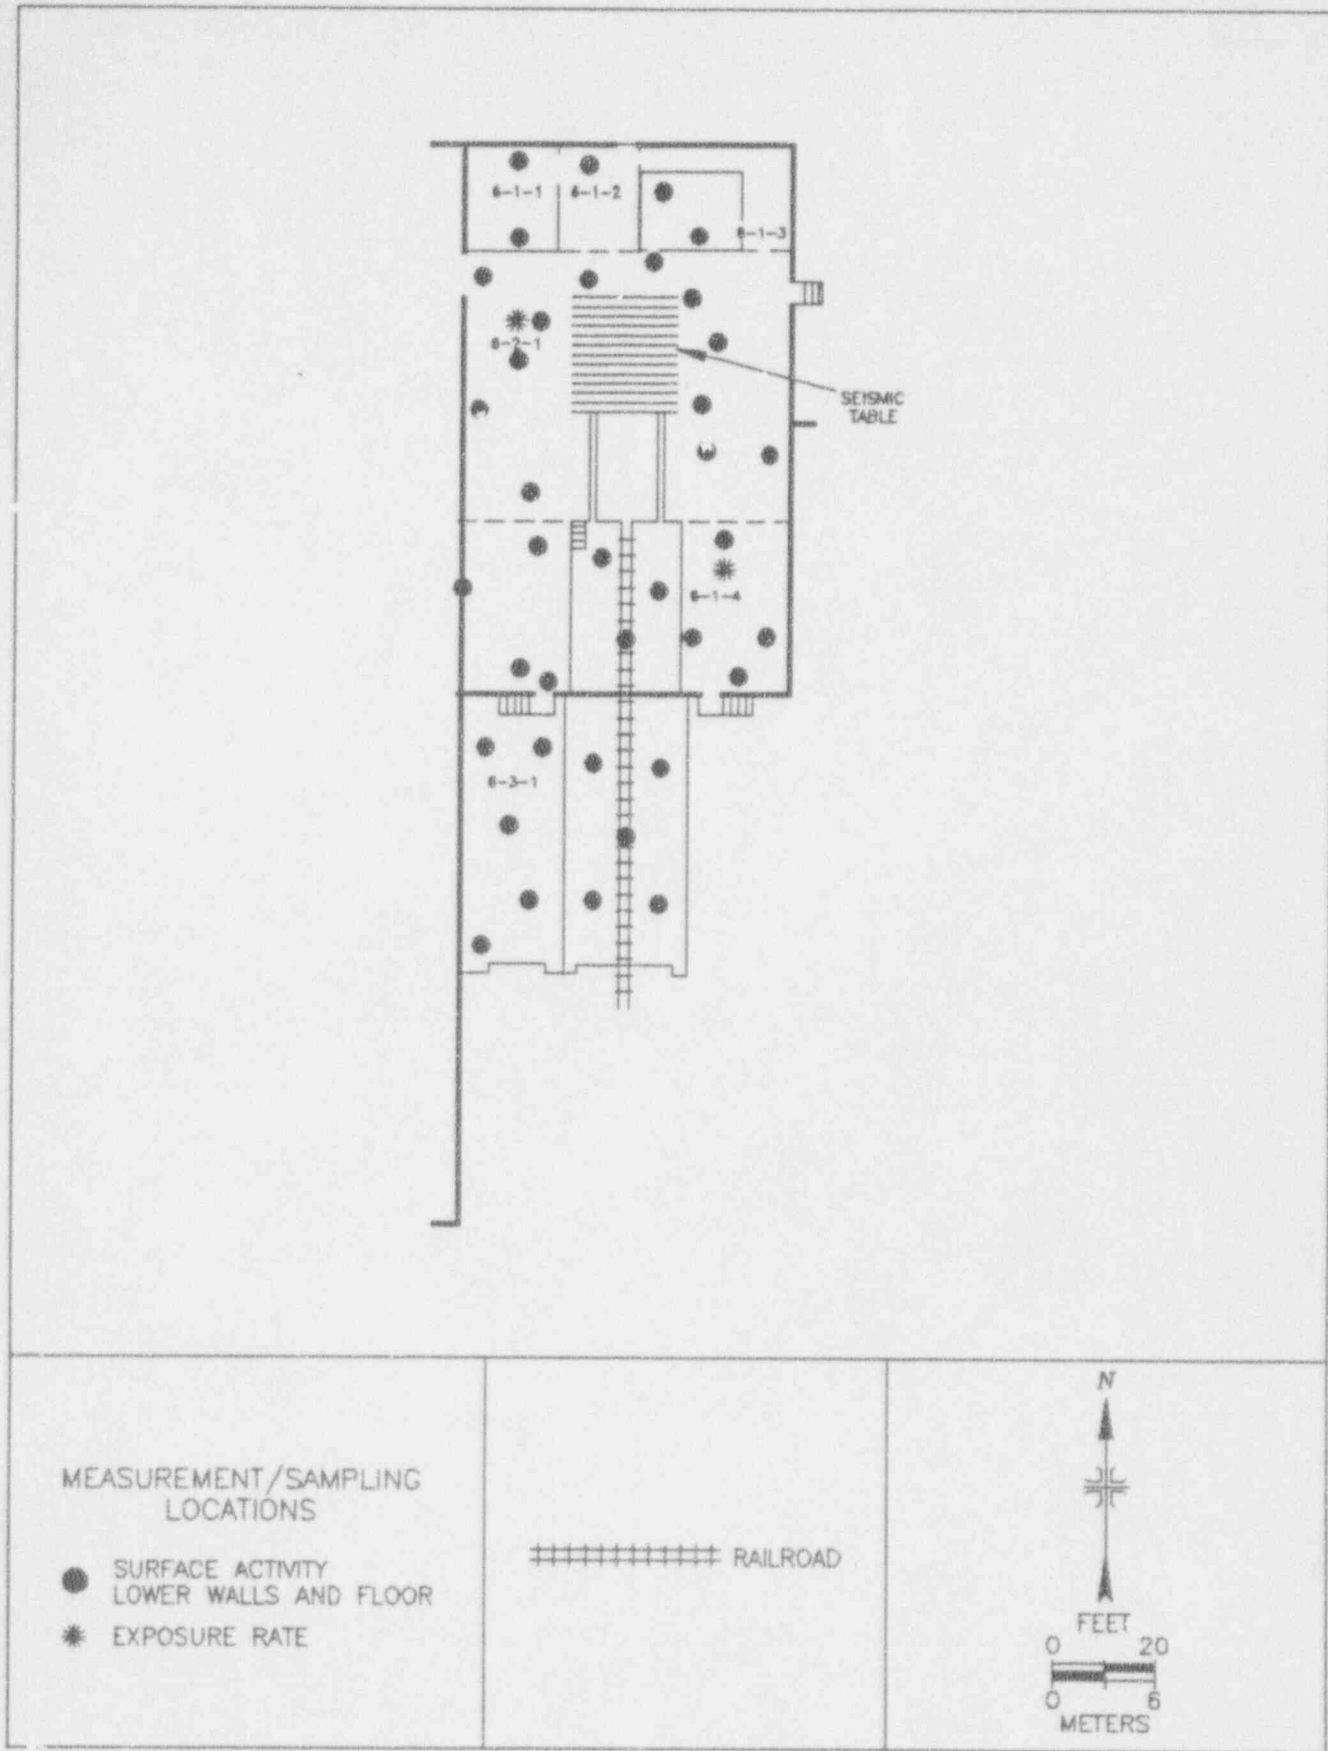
Building 6A, First Floor – Measurement and Sampling Locations
